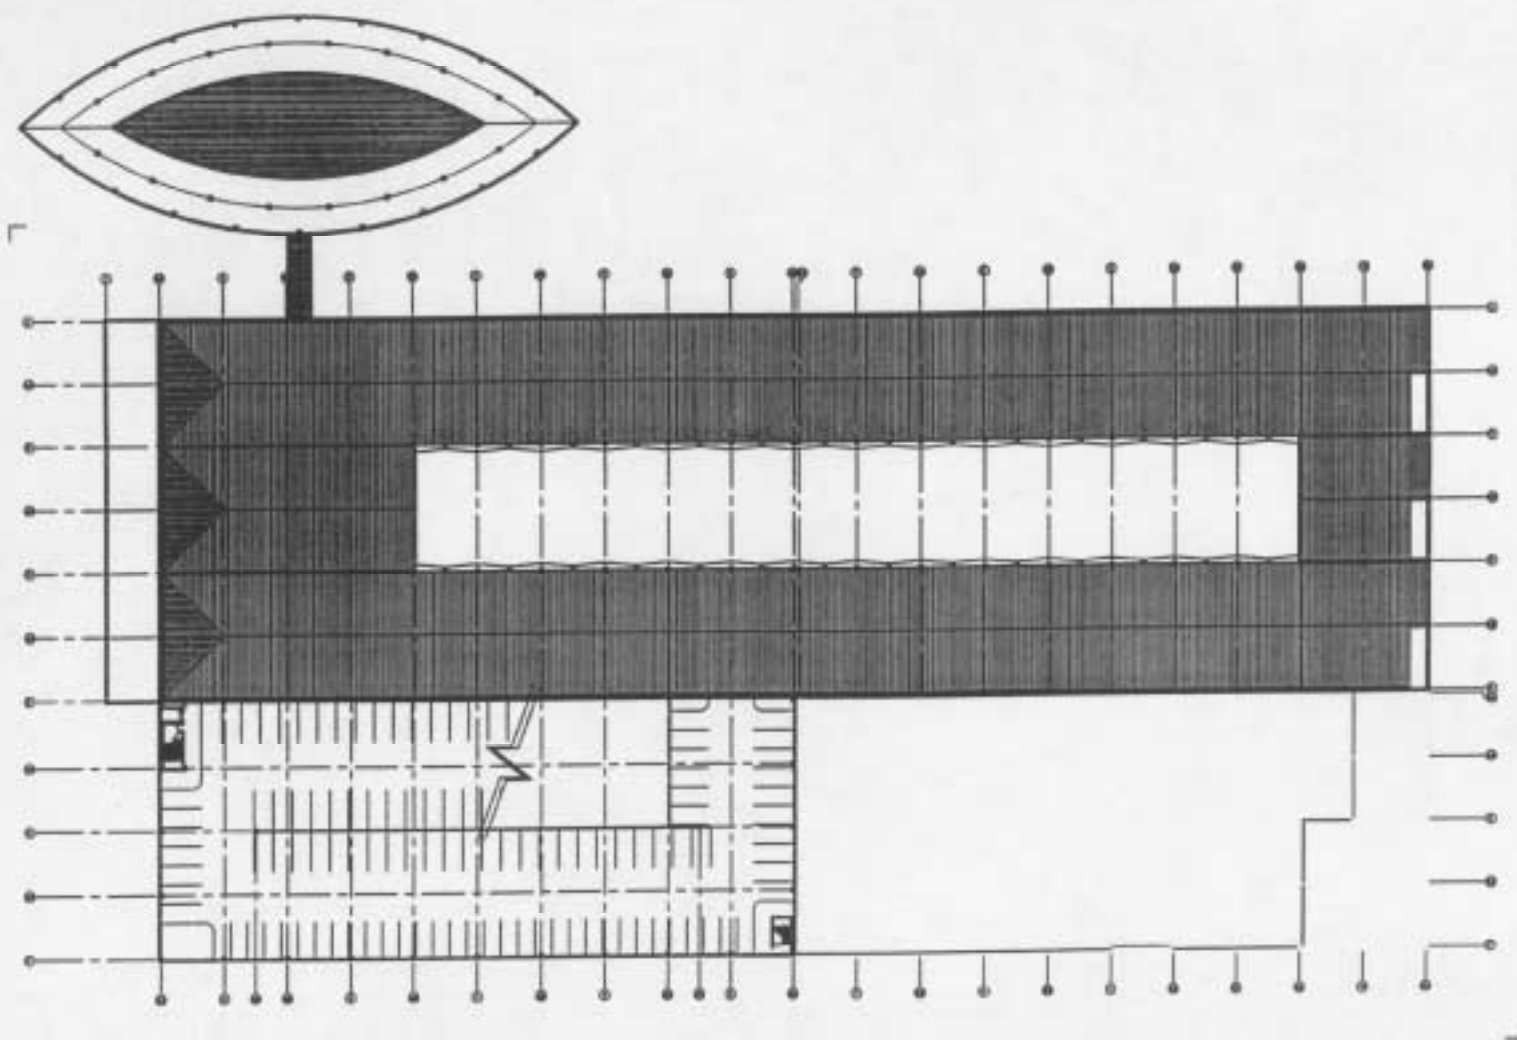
Clark and Nexsen roof plan view architectural drawing of the VASCIC building complex showing the tower (top), laboratory (middle), and garage (bottom) buildings.
